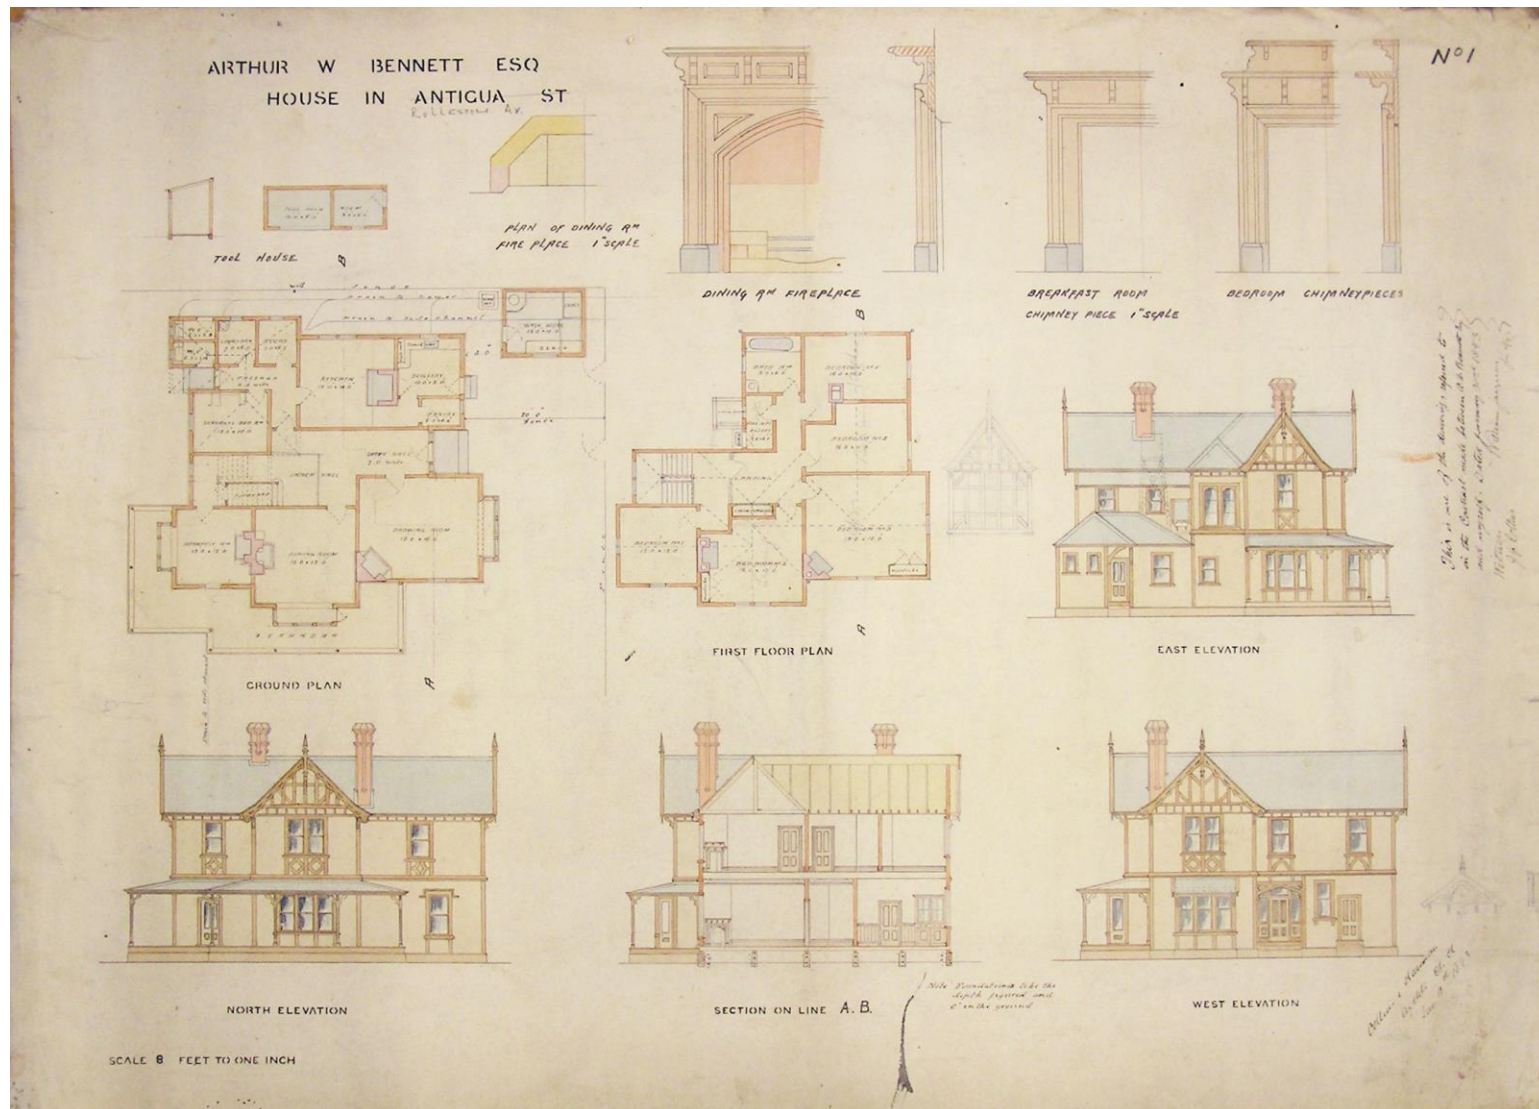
Collins and Harman, Arthur W. Bennett, Esq., House in Antigua Street, plans, elevations, section and details (1893).
